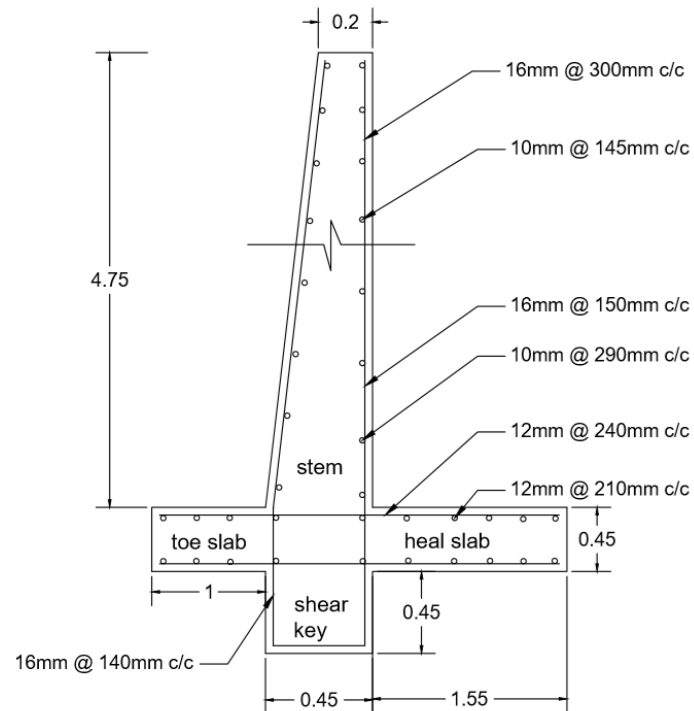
Cantilever retaining wall (Reinforcement details cross section)
